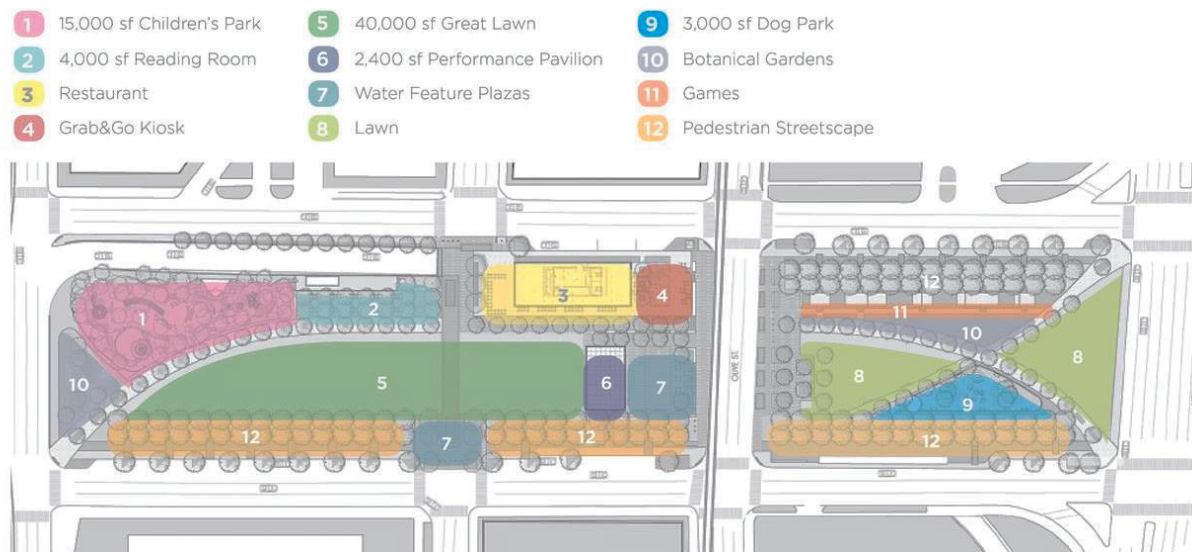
Klyde Warren Park Plan (Photo credit: OJB Landscape Architecture, Source: ASLA, 2017)
